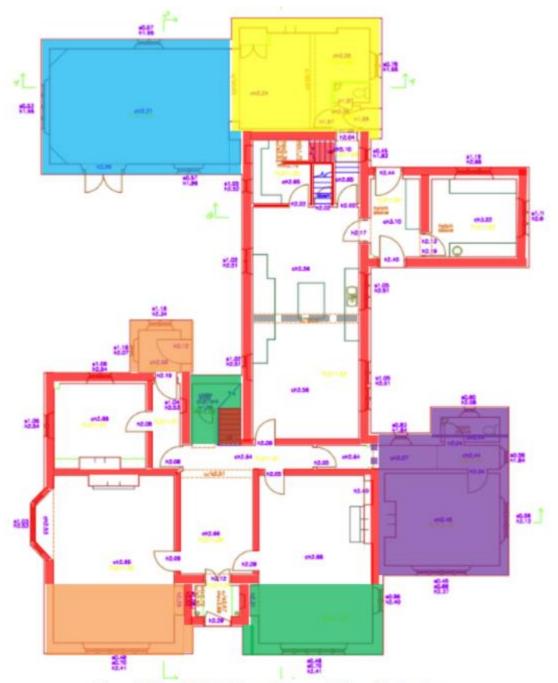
Morphological Plan of the ground floor of the farmhouse.
